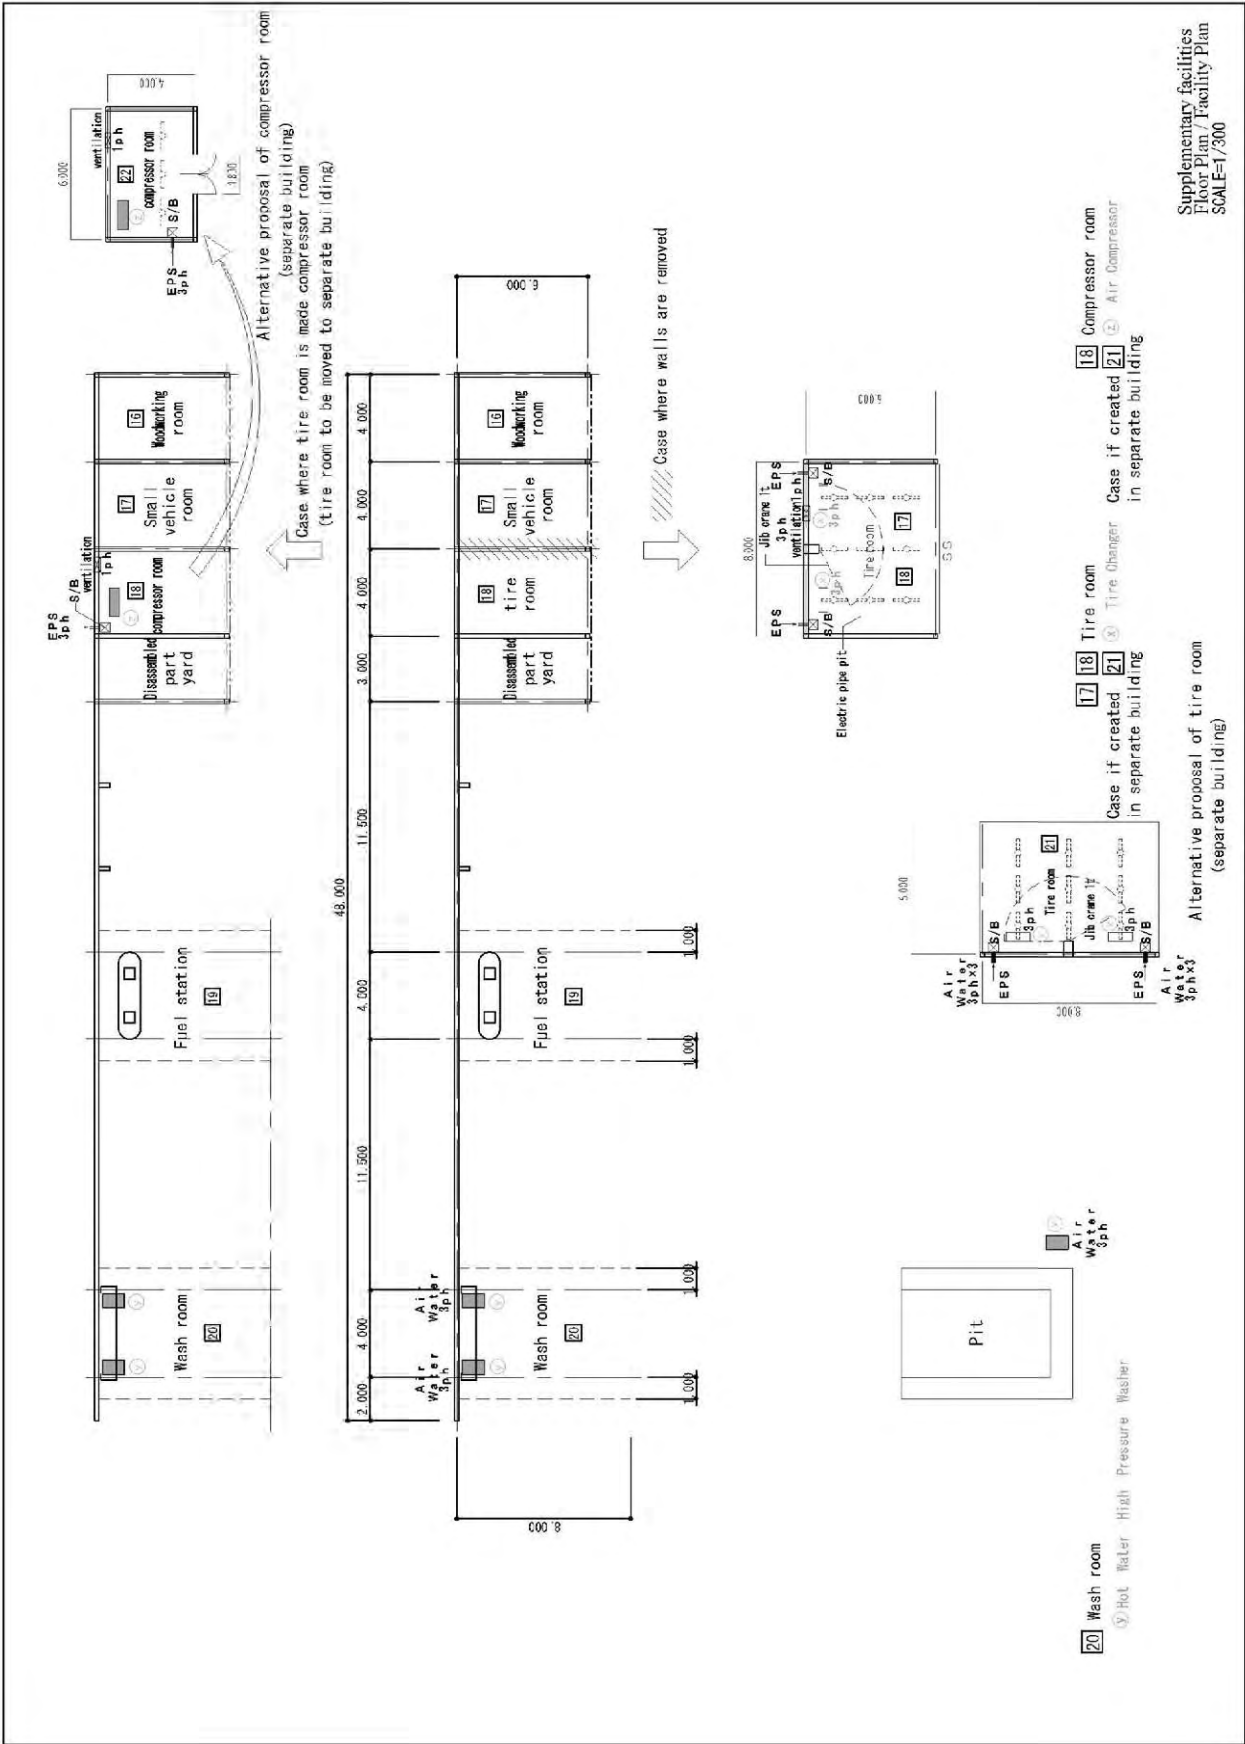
New Floor Plan and Facility Plan of Supplementary Facilities
